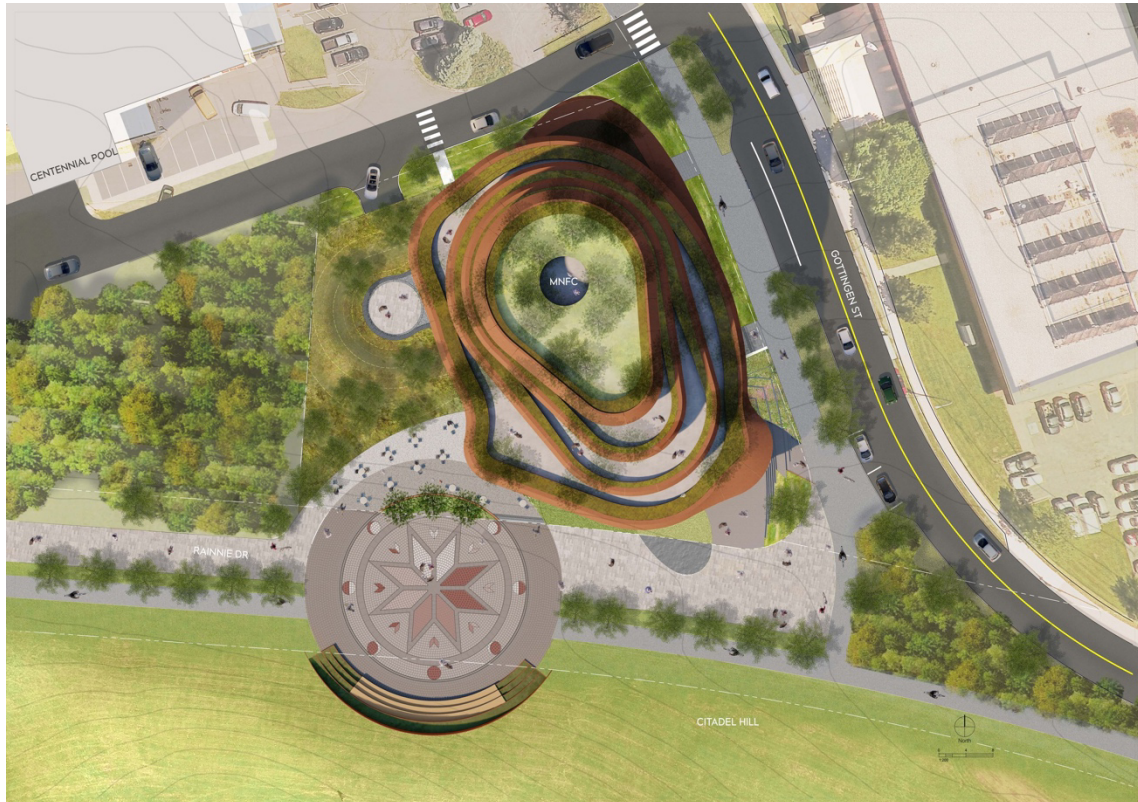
Proposed plan for the new MNFC building, Wi'jewinen. Fathom Studio, 2023.
